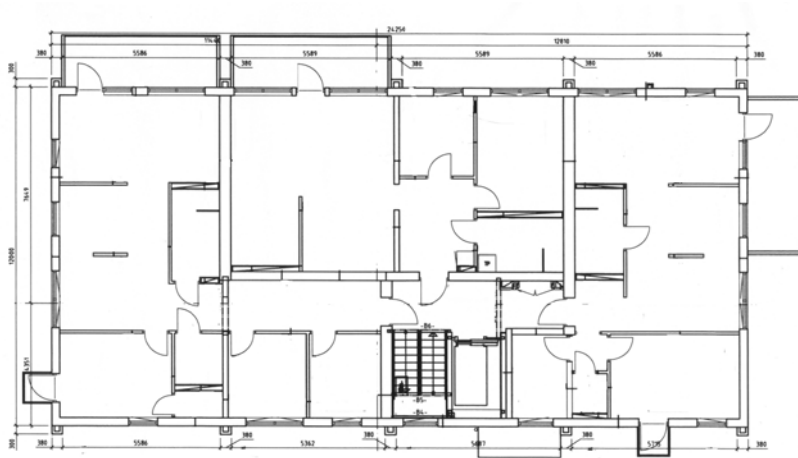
Layout for Sundsvall II, apartment block 4-5, 2nd to 5th floor.
